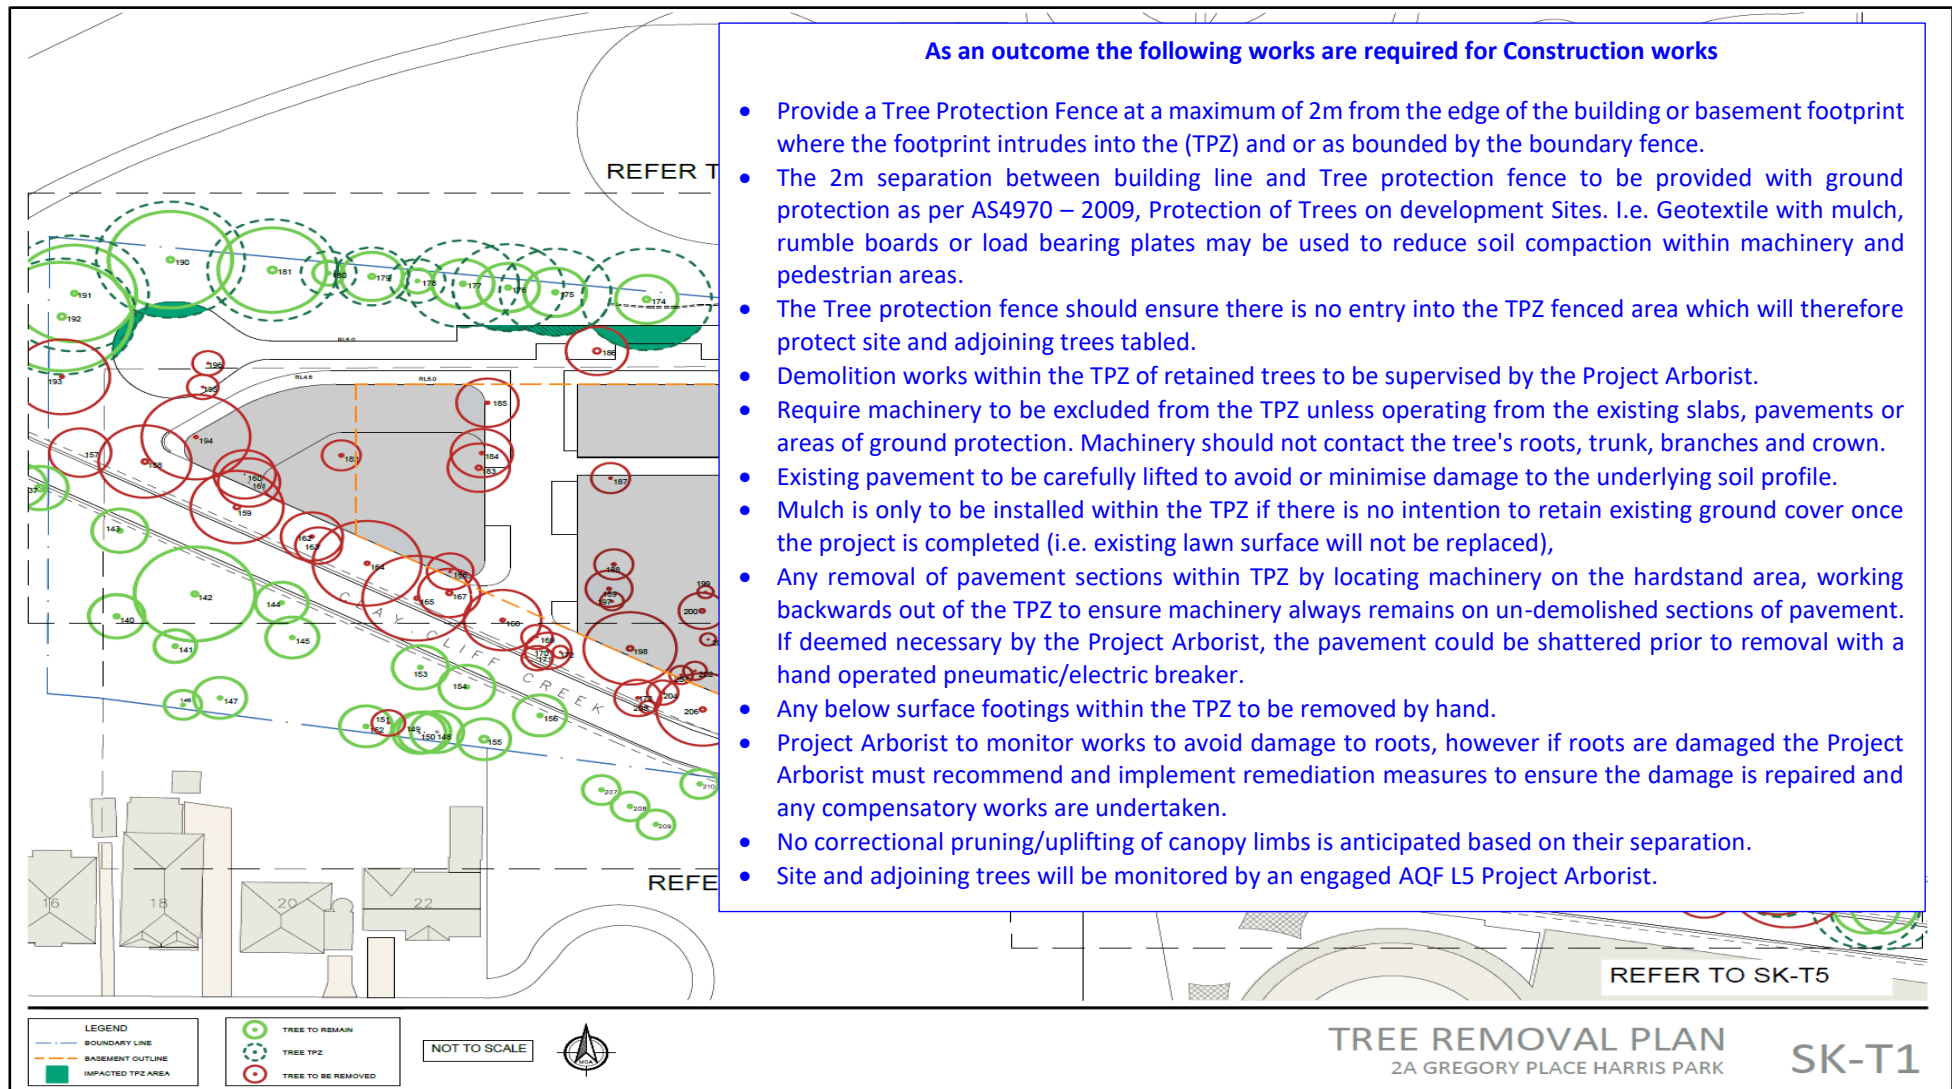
Shows site and adjoining tree protection measures regarding site construction stages.
